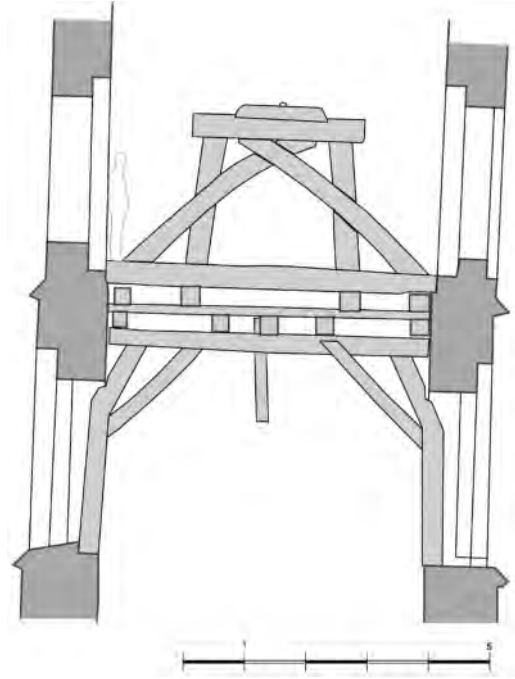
Mühlhausen, Divi Blasii, north tower bell frame 1461/62(d). Drawing: Iris Engelmann/VG Bild based on a building survey in: Thüringisches Landesamt für Denkmalpflege und Archäologie, Bau- und Kunstdenkmalpflege, Archive reg. 64.066-003 Divi-Blasii Kirche Mühlhausen, map no.: 25/92, catalogue: building survey 15.5. – 09.9.1991 north tower, Michael Henkel, Stefan Roser, Tanja Schwirko.
